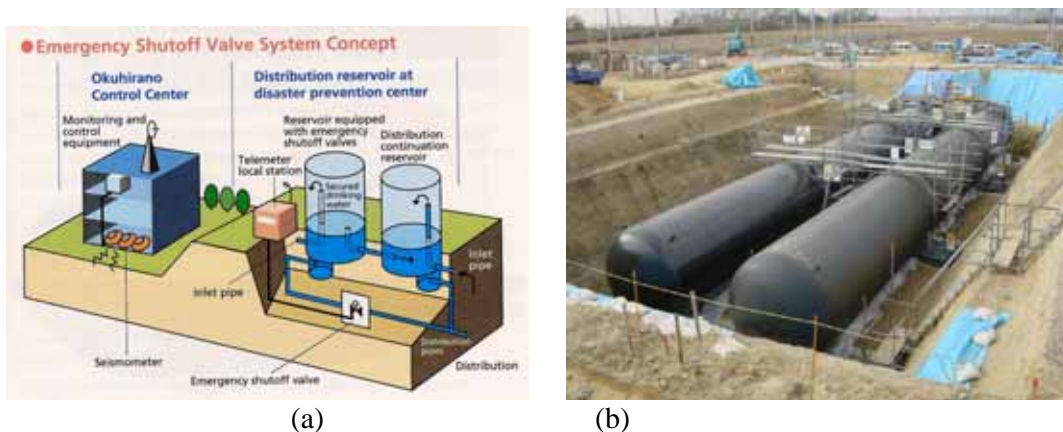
(a) Schematic diagram of the emergency storage system; (b) view of storage facility (Mizukuchi 2008).
